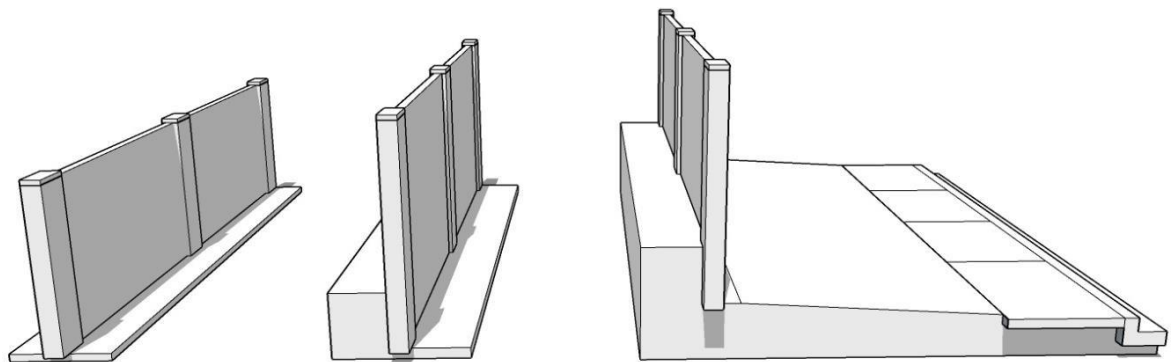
Wall Scenarios – Even Lots, Uneven Lots, Lot at Higher Elevation than Street
